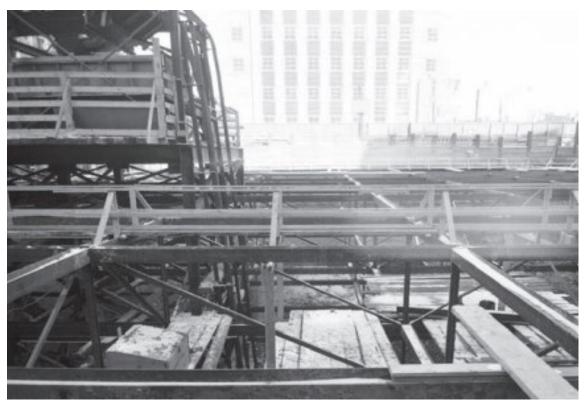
1958 image of the property looking north towards Richmond Street West during construction (Panda Associates).
